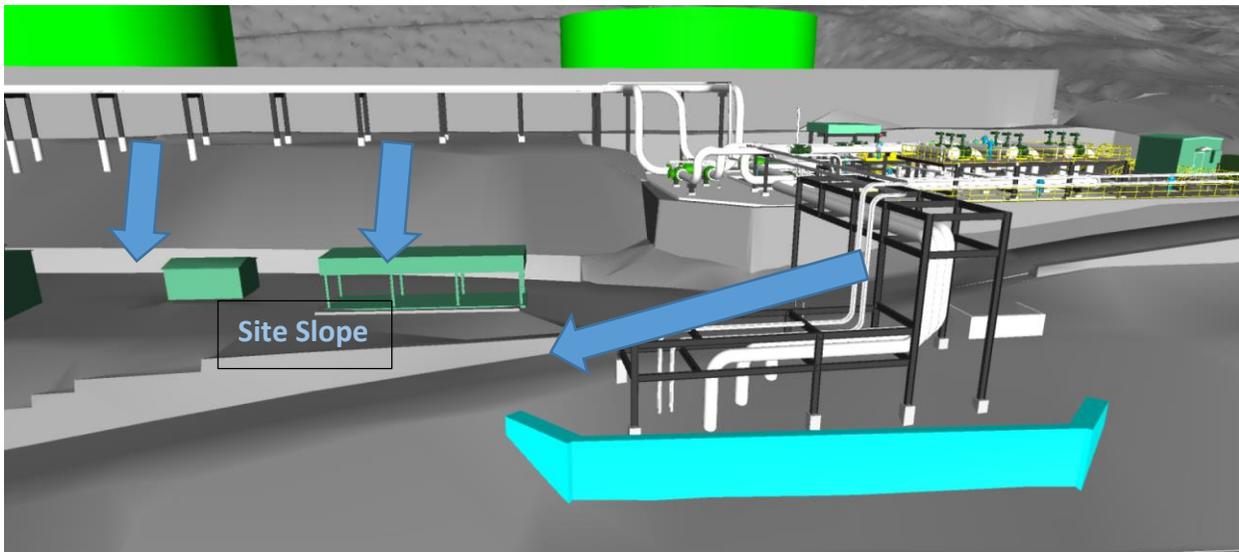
Looking south at the site slope north of the south section of pipeline and east of the valve manifold area [8].
